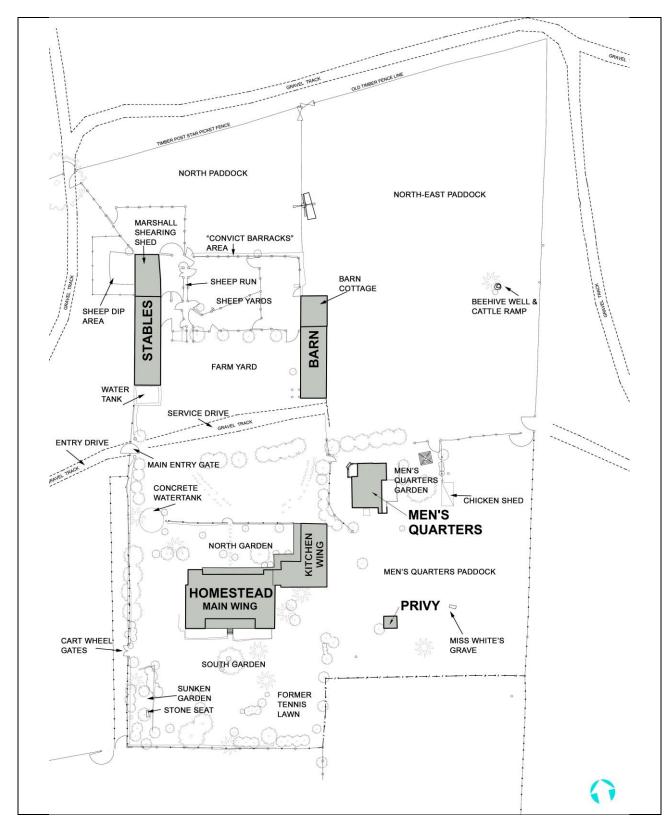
Site plan of the Ravensworth Homestead Complex
